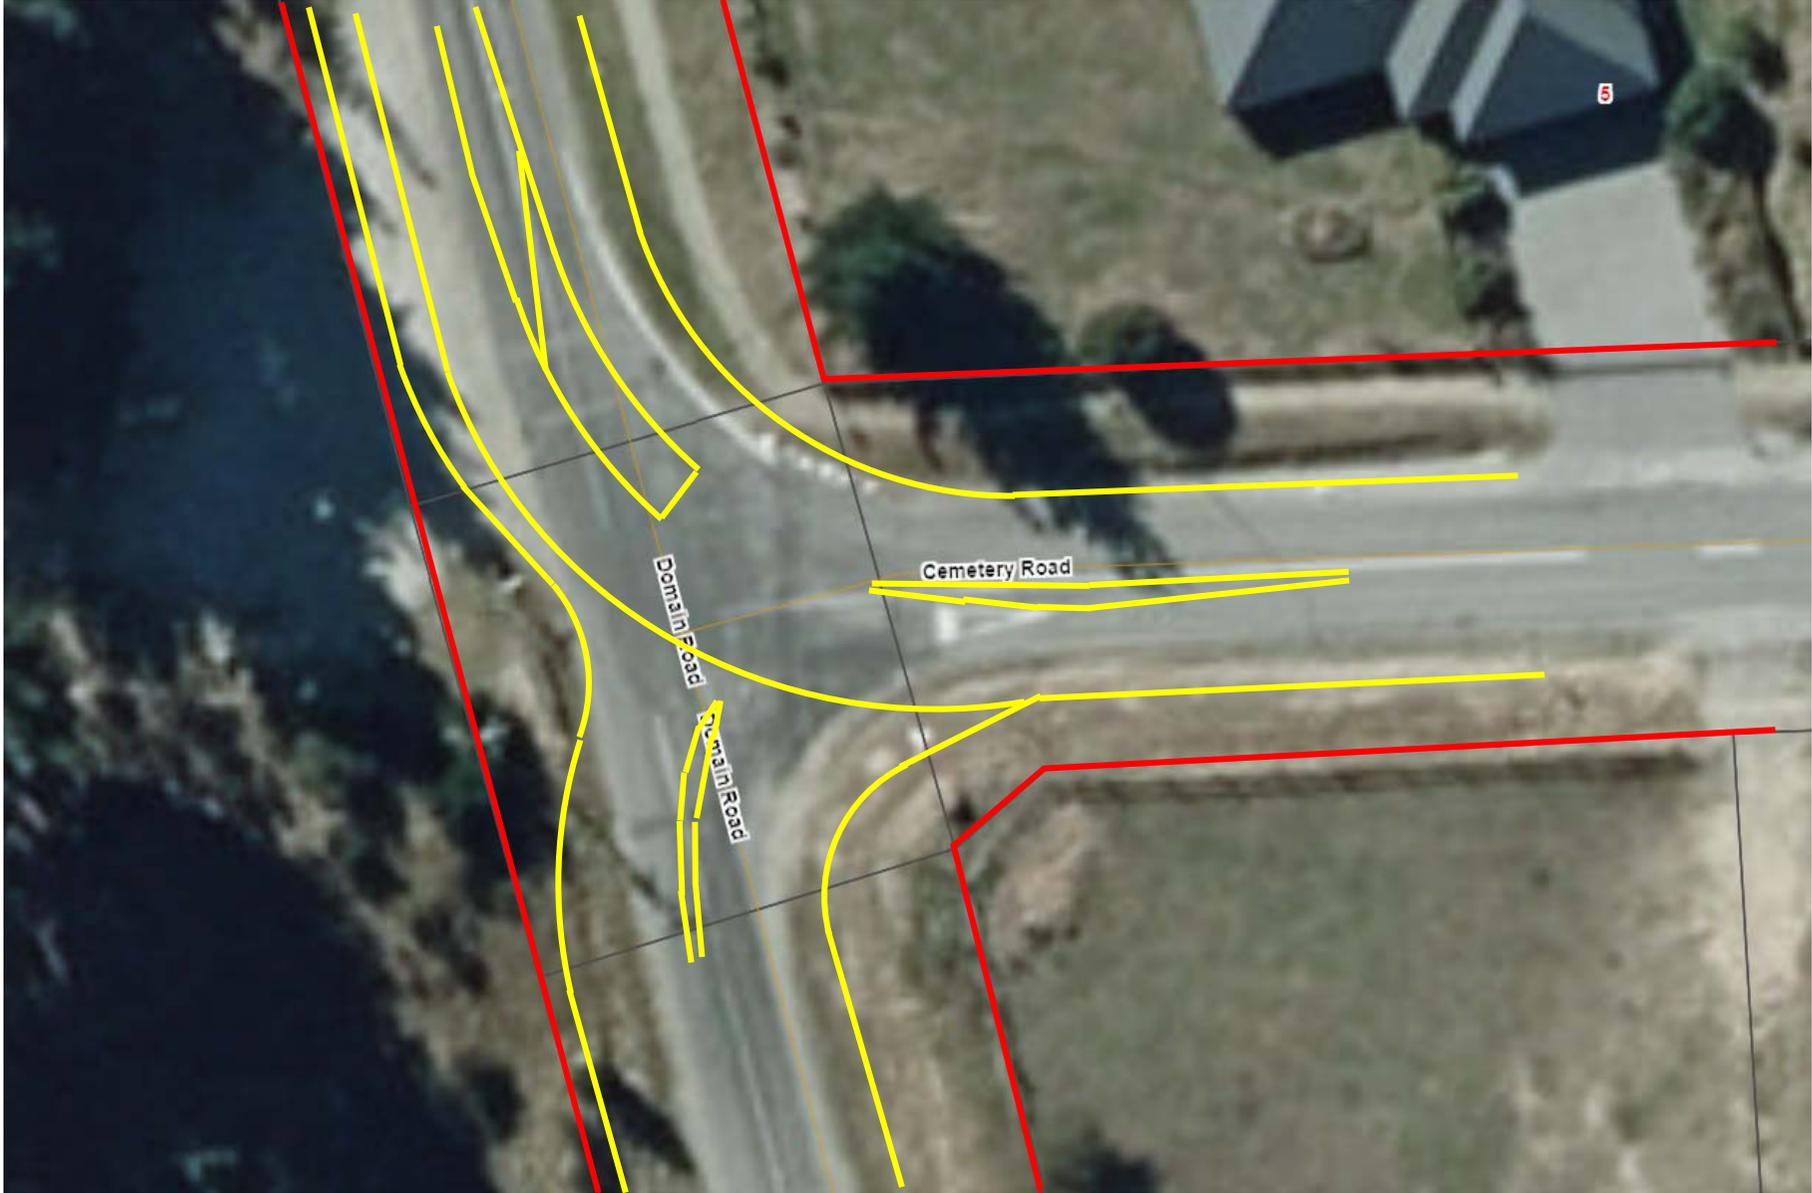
Ivory Street / Northbrook Road Intersection, Markings Overlaid onto Domain Road / Cemetery Road Intersection
